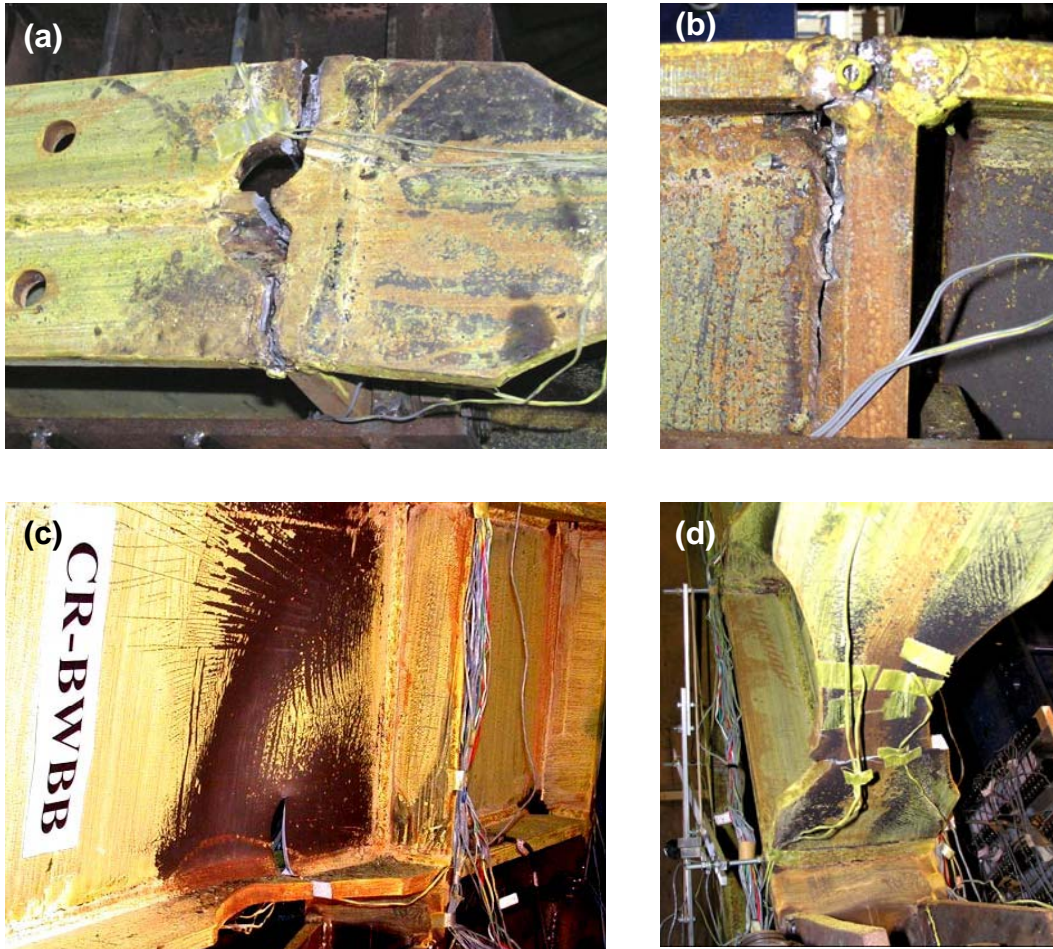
Failure of Boundary Elements in Single Story SPSW Specimen (Vian and Bruneau 2005): (a) Fracture at VBE Connection to Upper HBE; (b) Side View of Part (a); (c) Fracture at RBS Location of Lower HBE; (d) Bottom View of Part (c)
